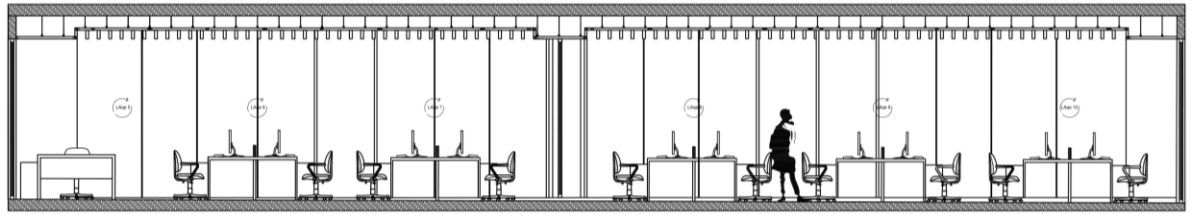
The floor plan of the Demay Architects' open-plan office (not to scale)
